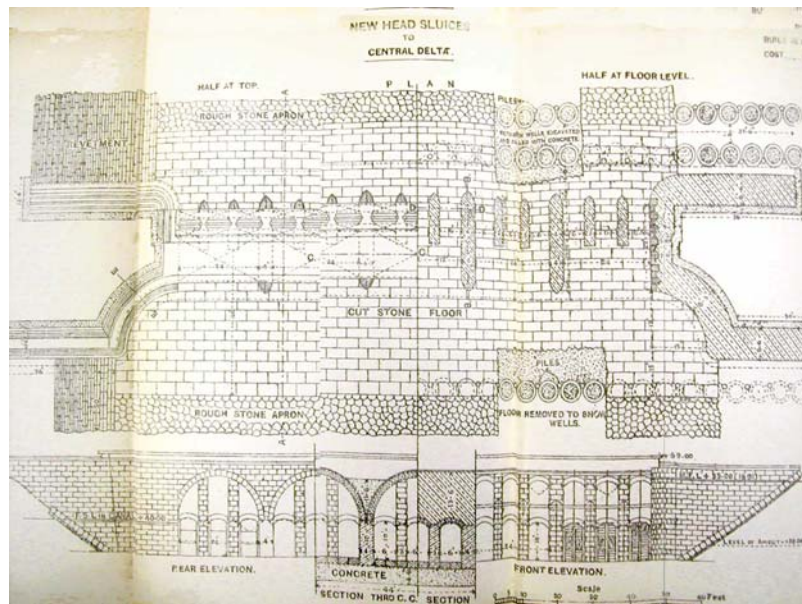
Foundations on piles of brick masonry called wells (example of a sluice in central India).
